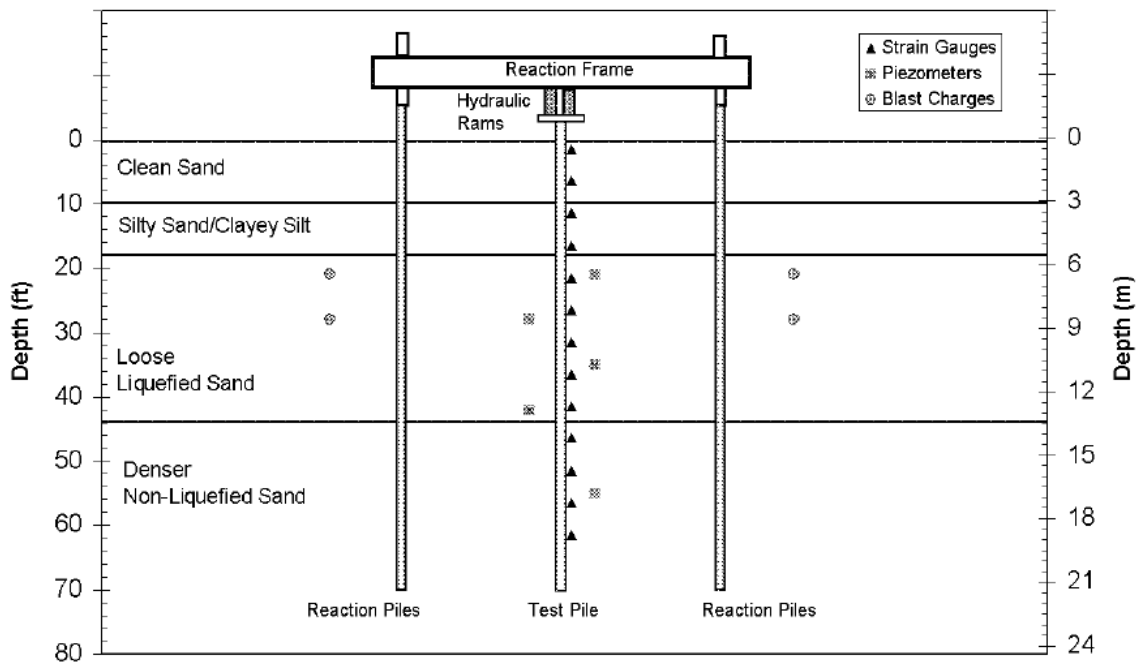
Layout of test pile, instrumentation, and blast charges relative to the soil profile at the Massey Tunnel test site south of Vancouver, Canada (Rollins and Strand 2006).
